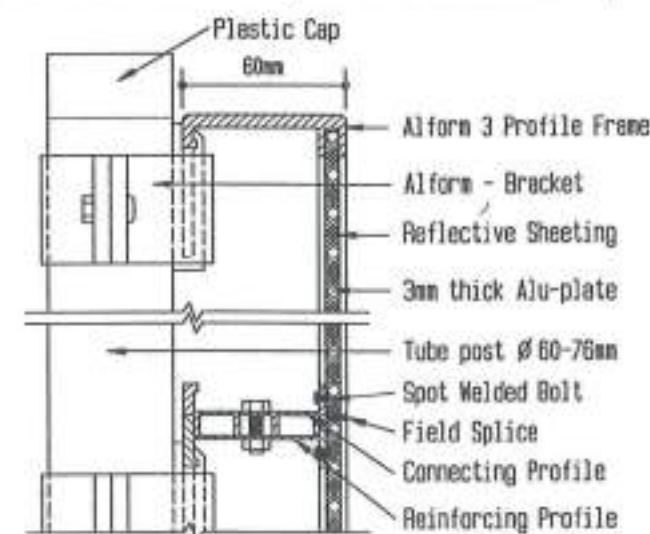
Smaller Sign on Single Support Side Elevation
